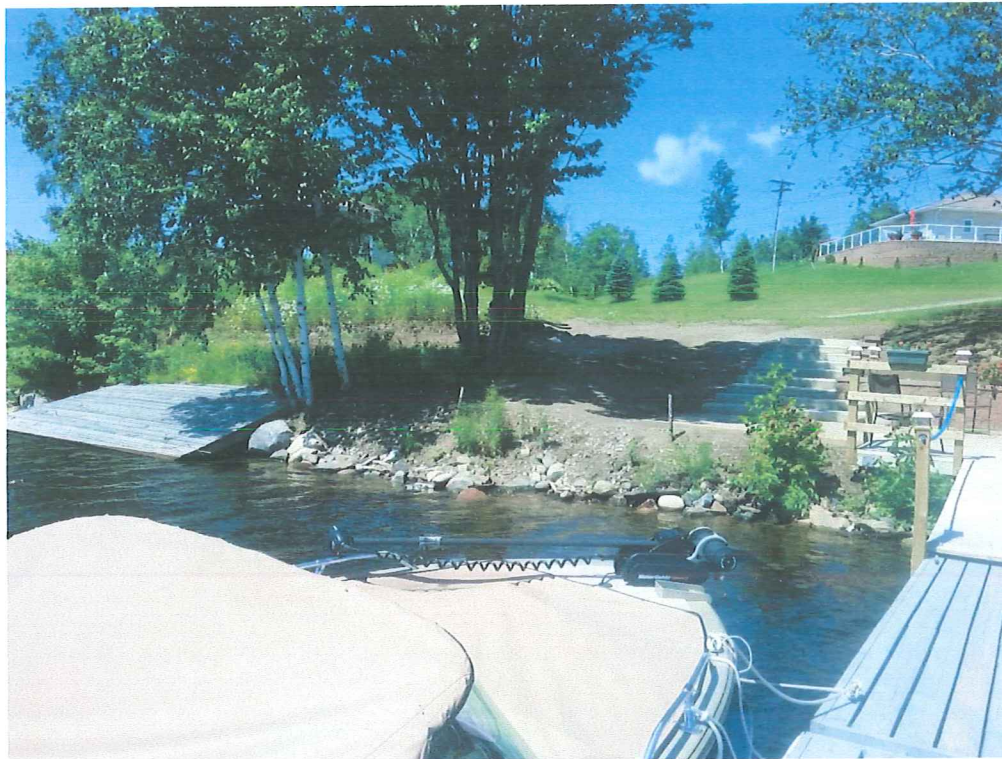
West of the existing dock. Facing west, June 28, 2017.
